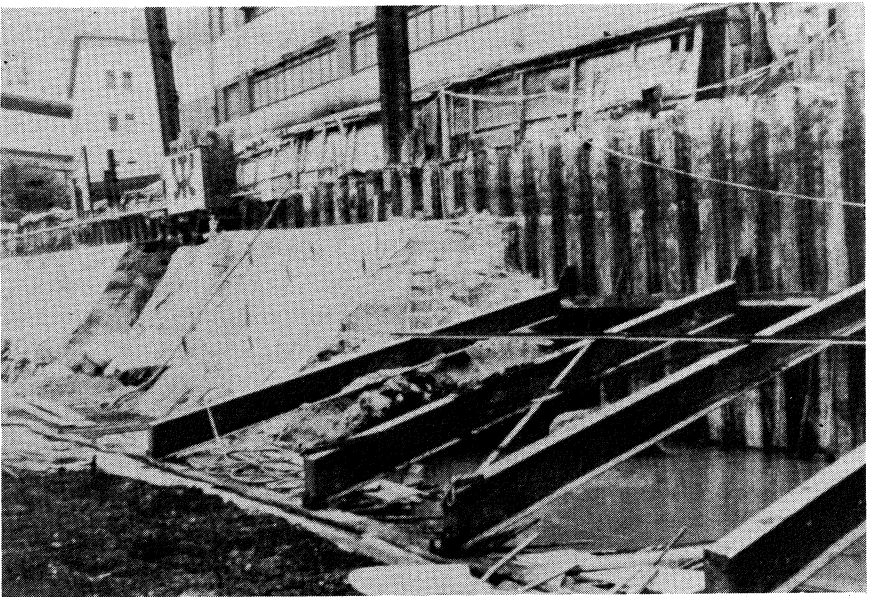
Inadequate Toe Supports to Raking Struts; Left Side of Photograph Shows Collapse of the Side Slope in Front of the Steel Sheet Piling.
